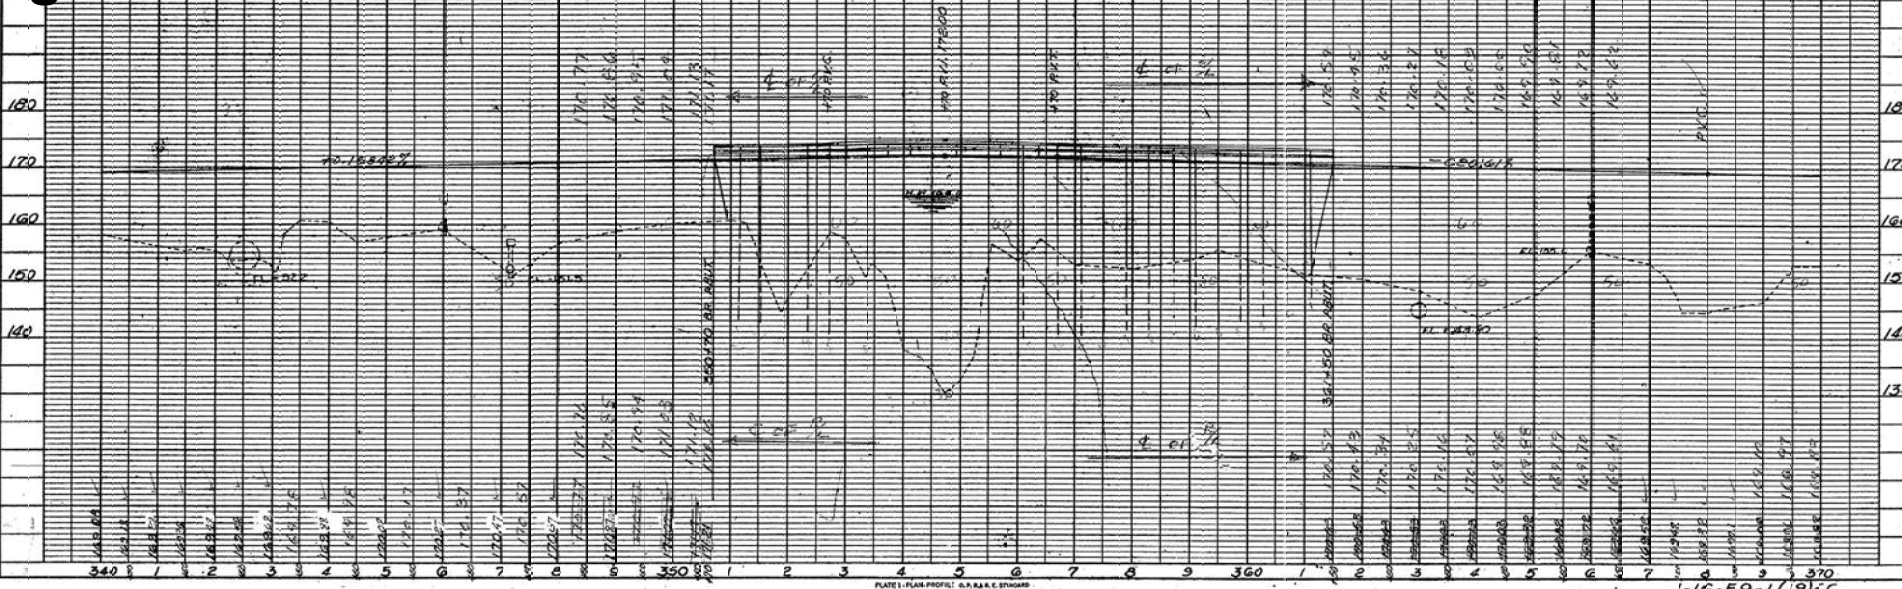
PLAN PROFILE S.P. & A.E. STUBBS
